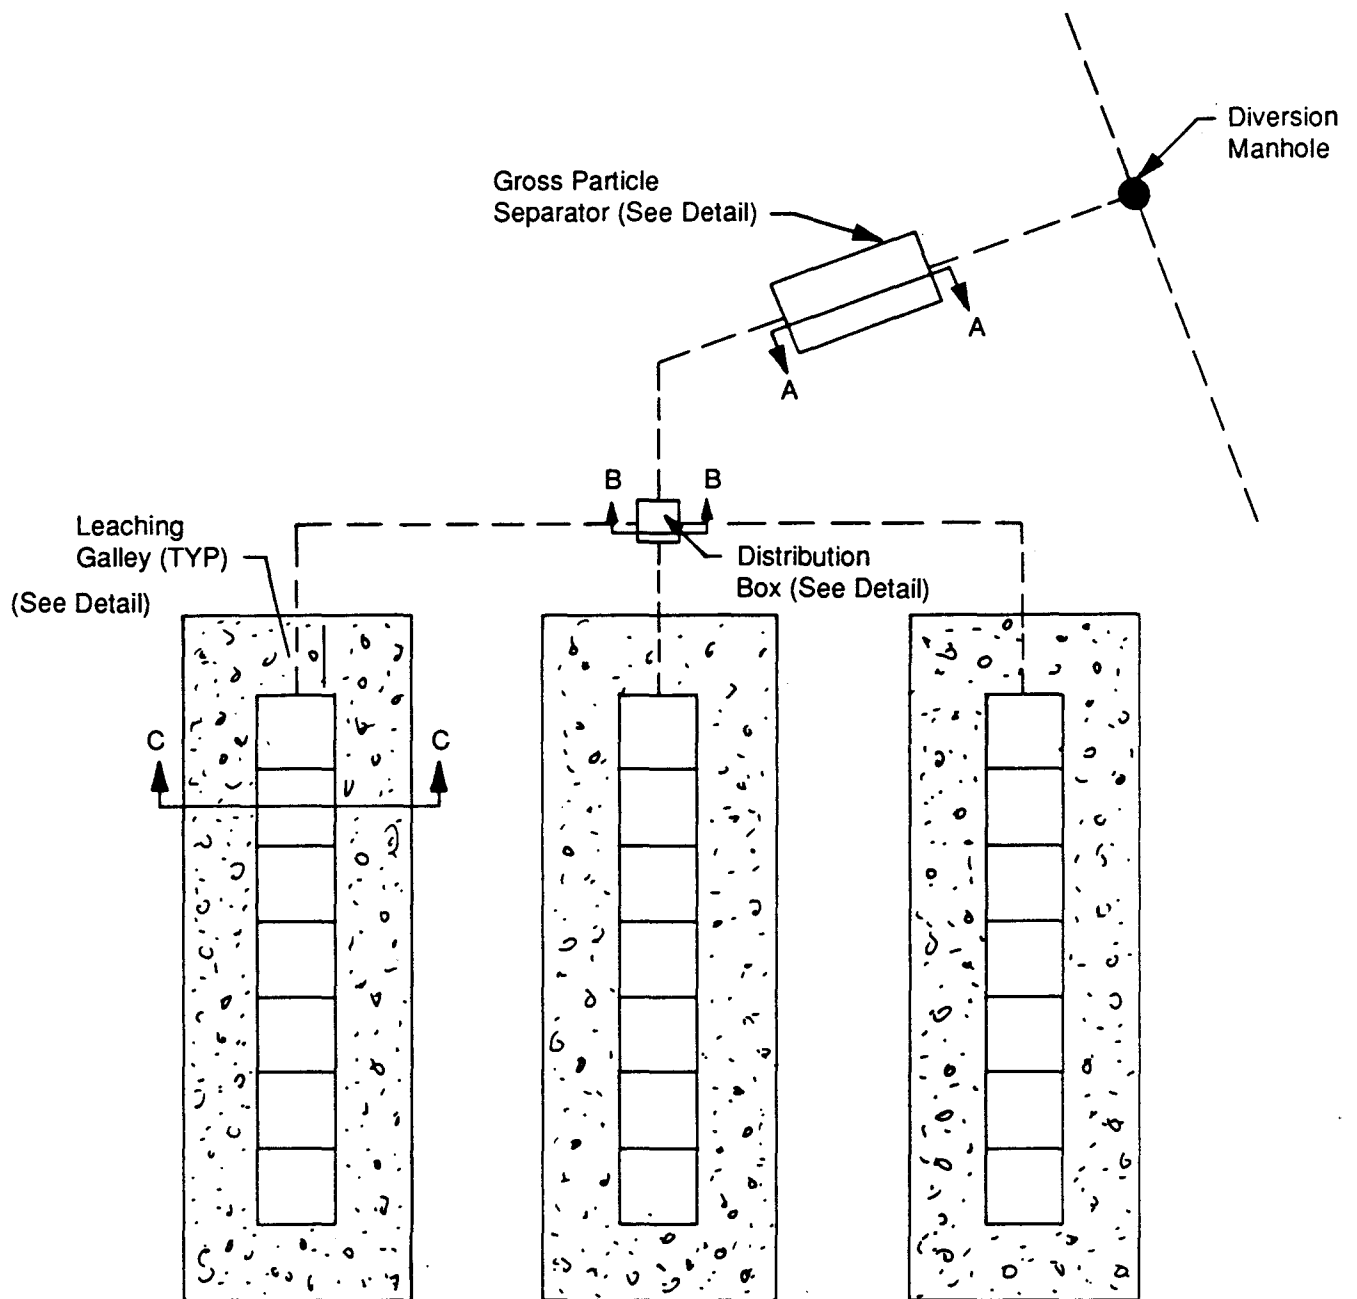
CHESTER PARK LEACHING GALLEY PLAN
